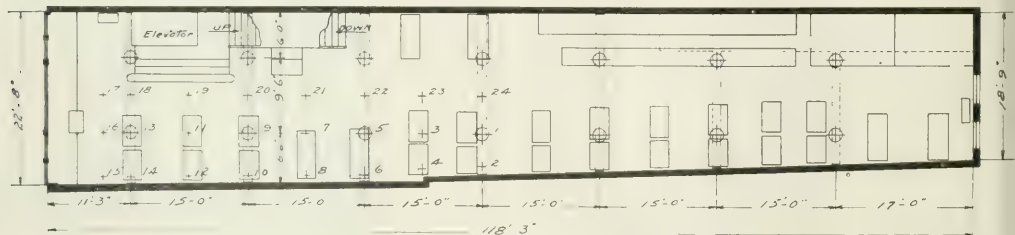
Second-Floor Plan of Restaurant, Showing Location of Lamps.
